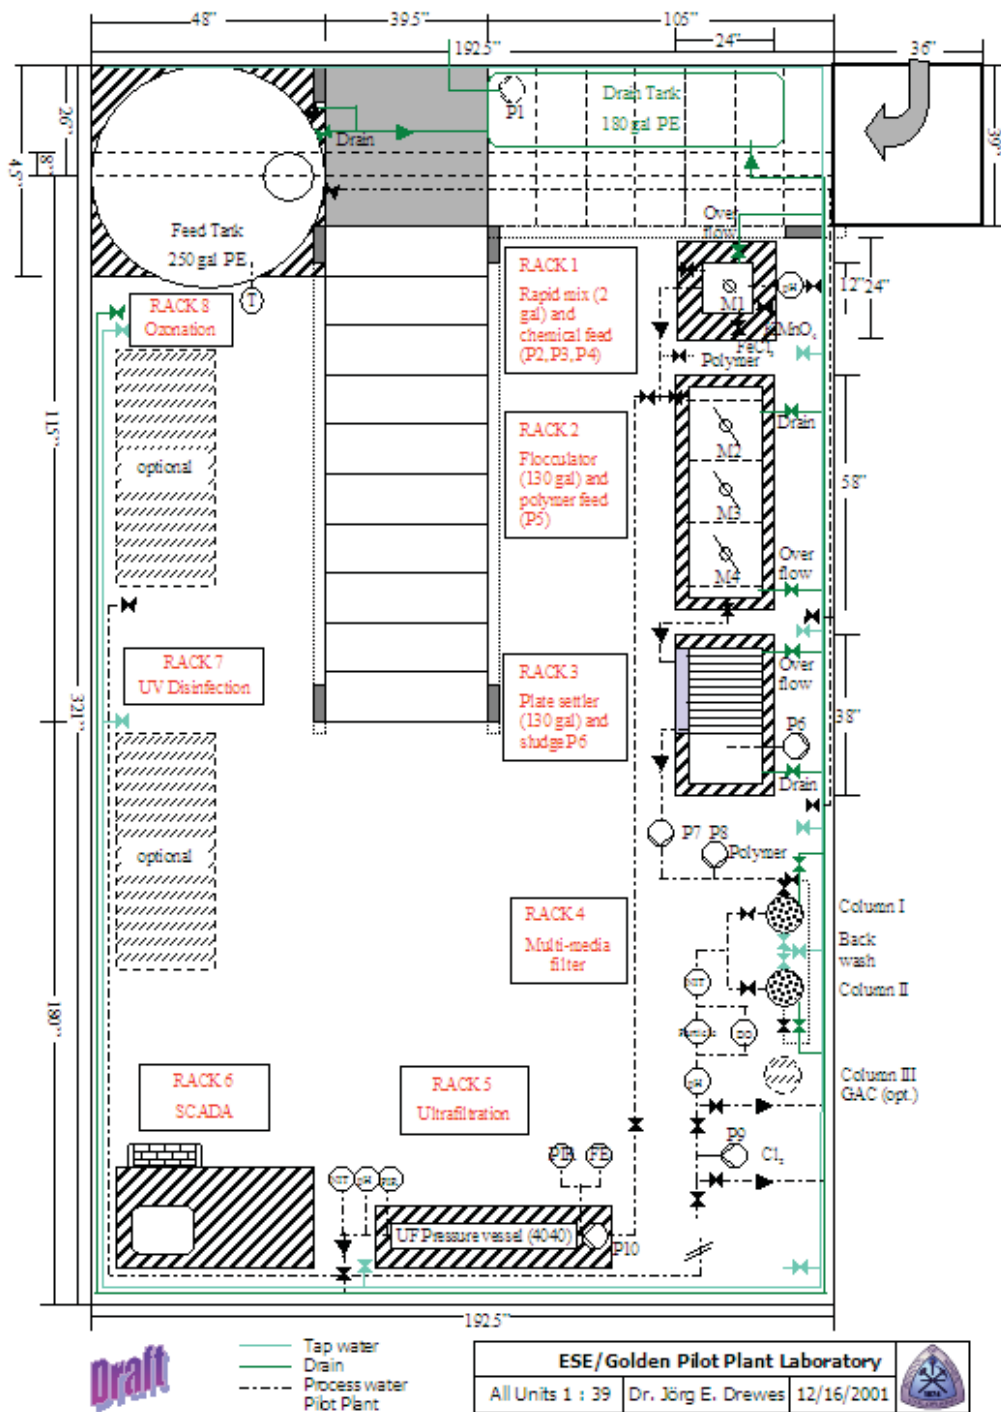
Ground plan pilot plant (not drawn to scale)
